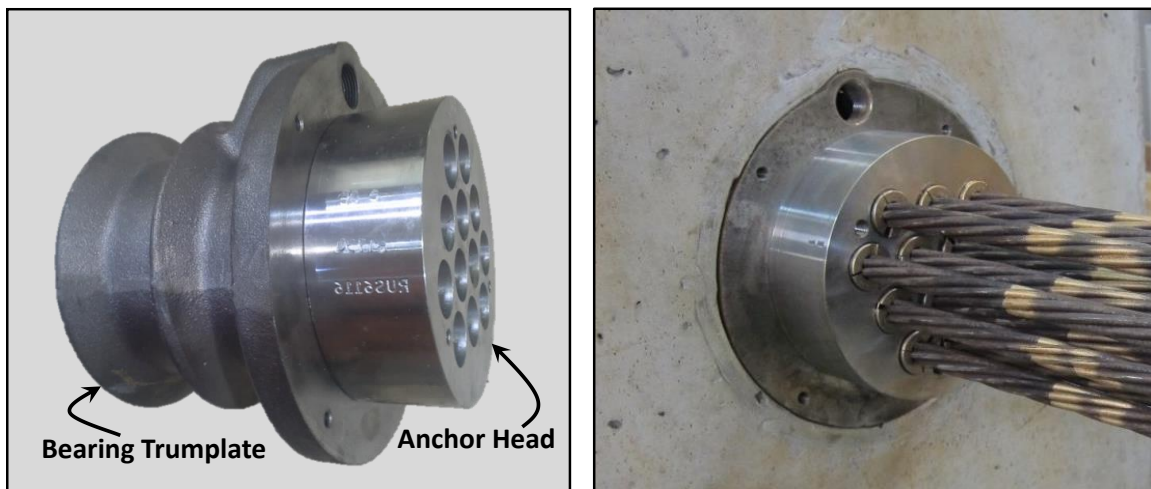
Post-tensioning anchorage (adapted from Moore, 2014)
